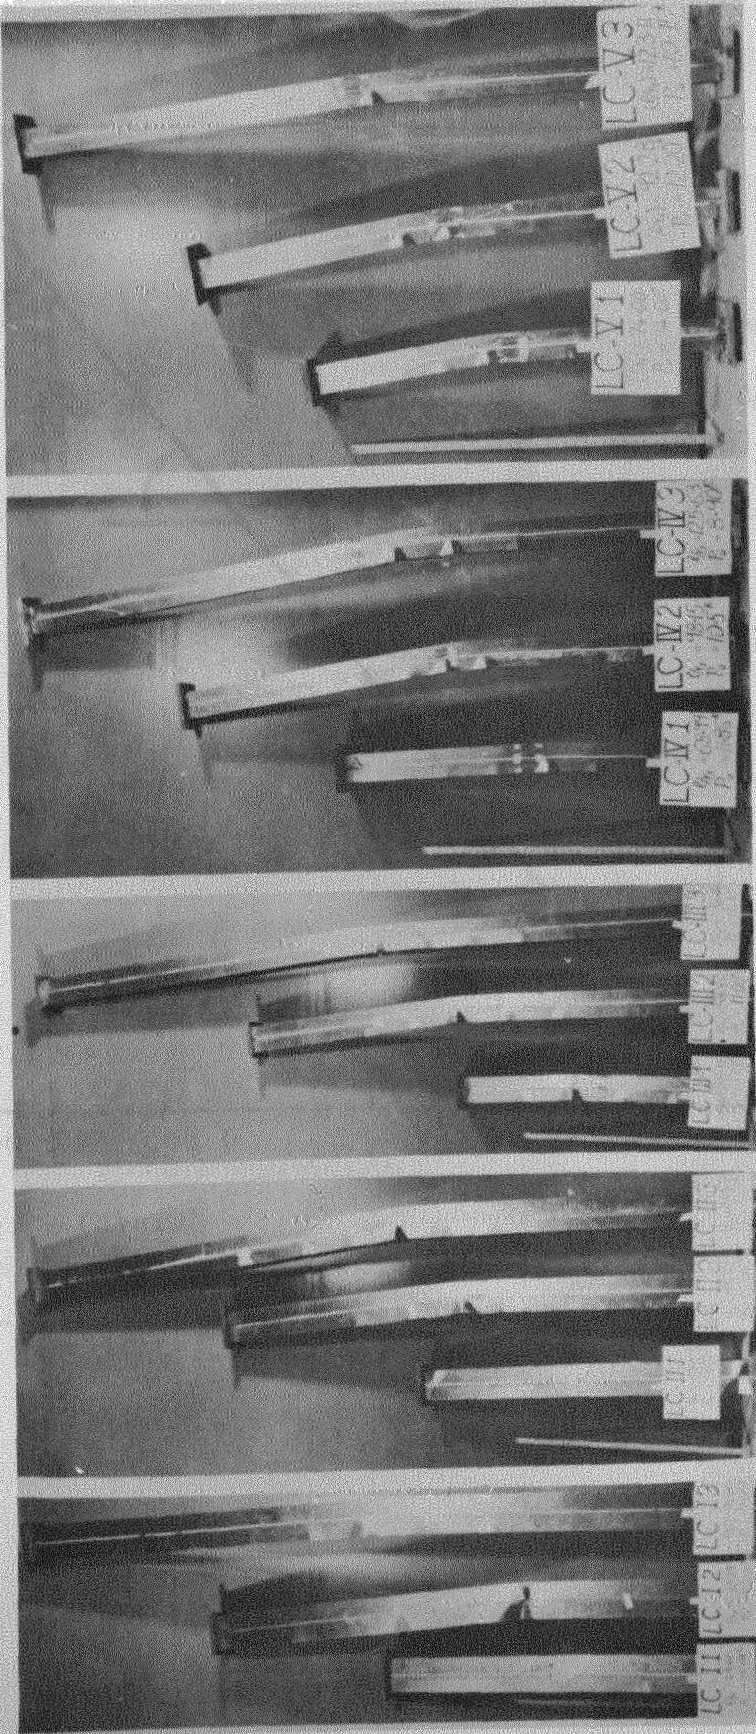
COMPRESSION MEMBERS AFTER FAILURE
